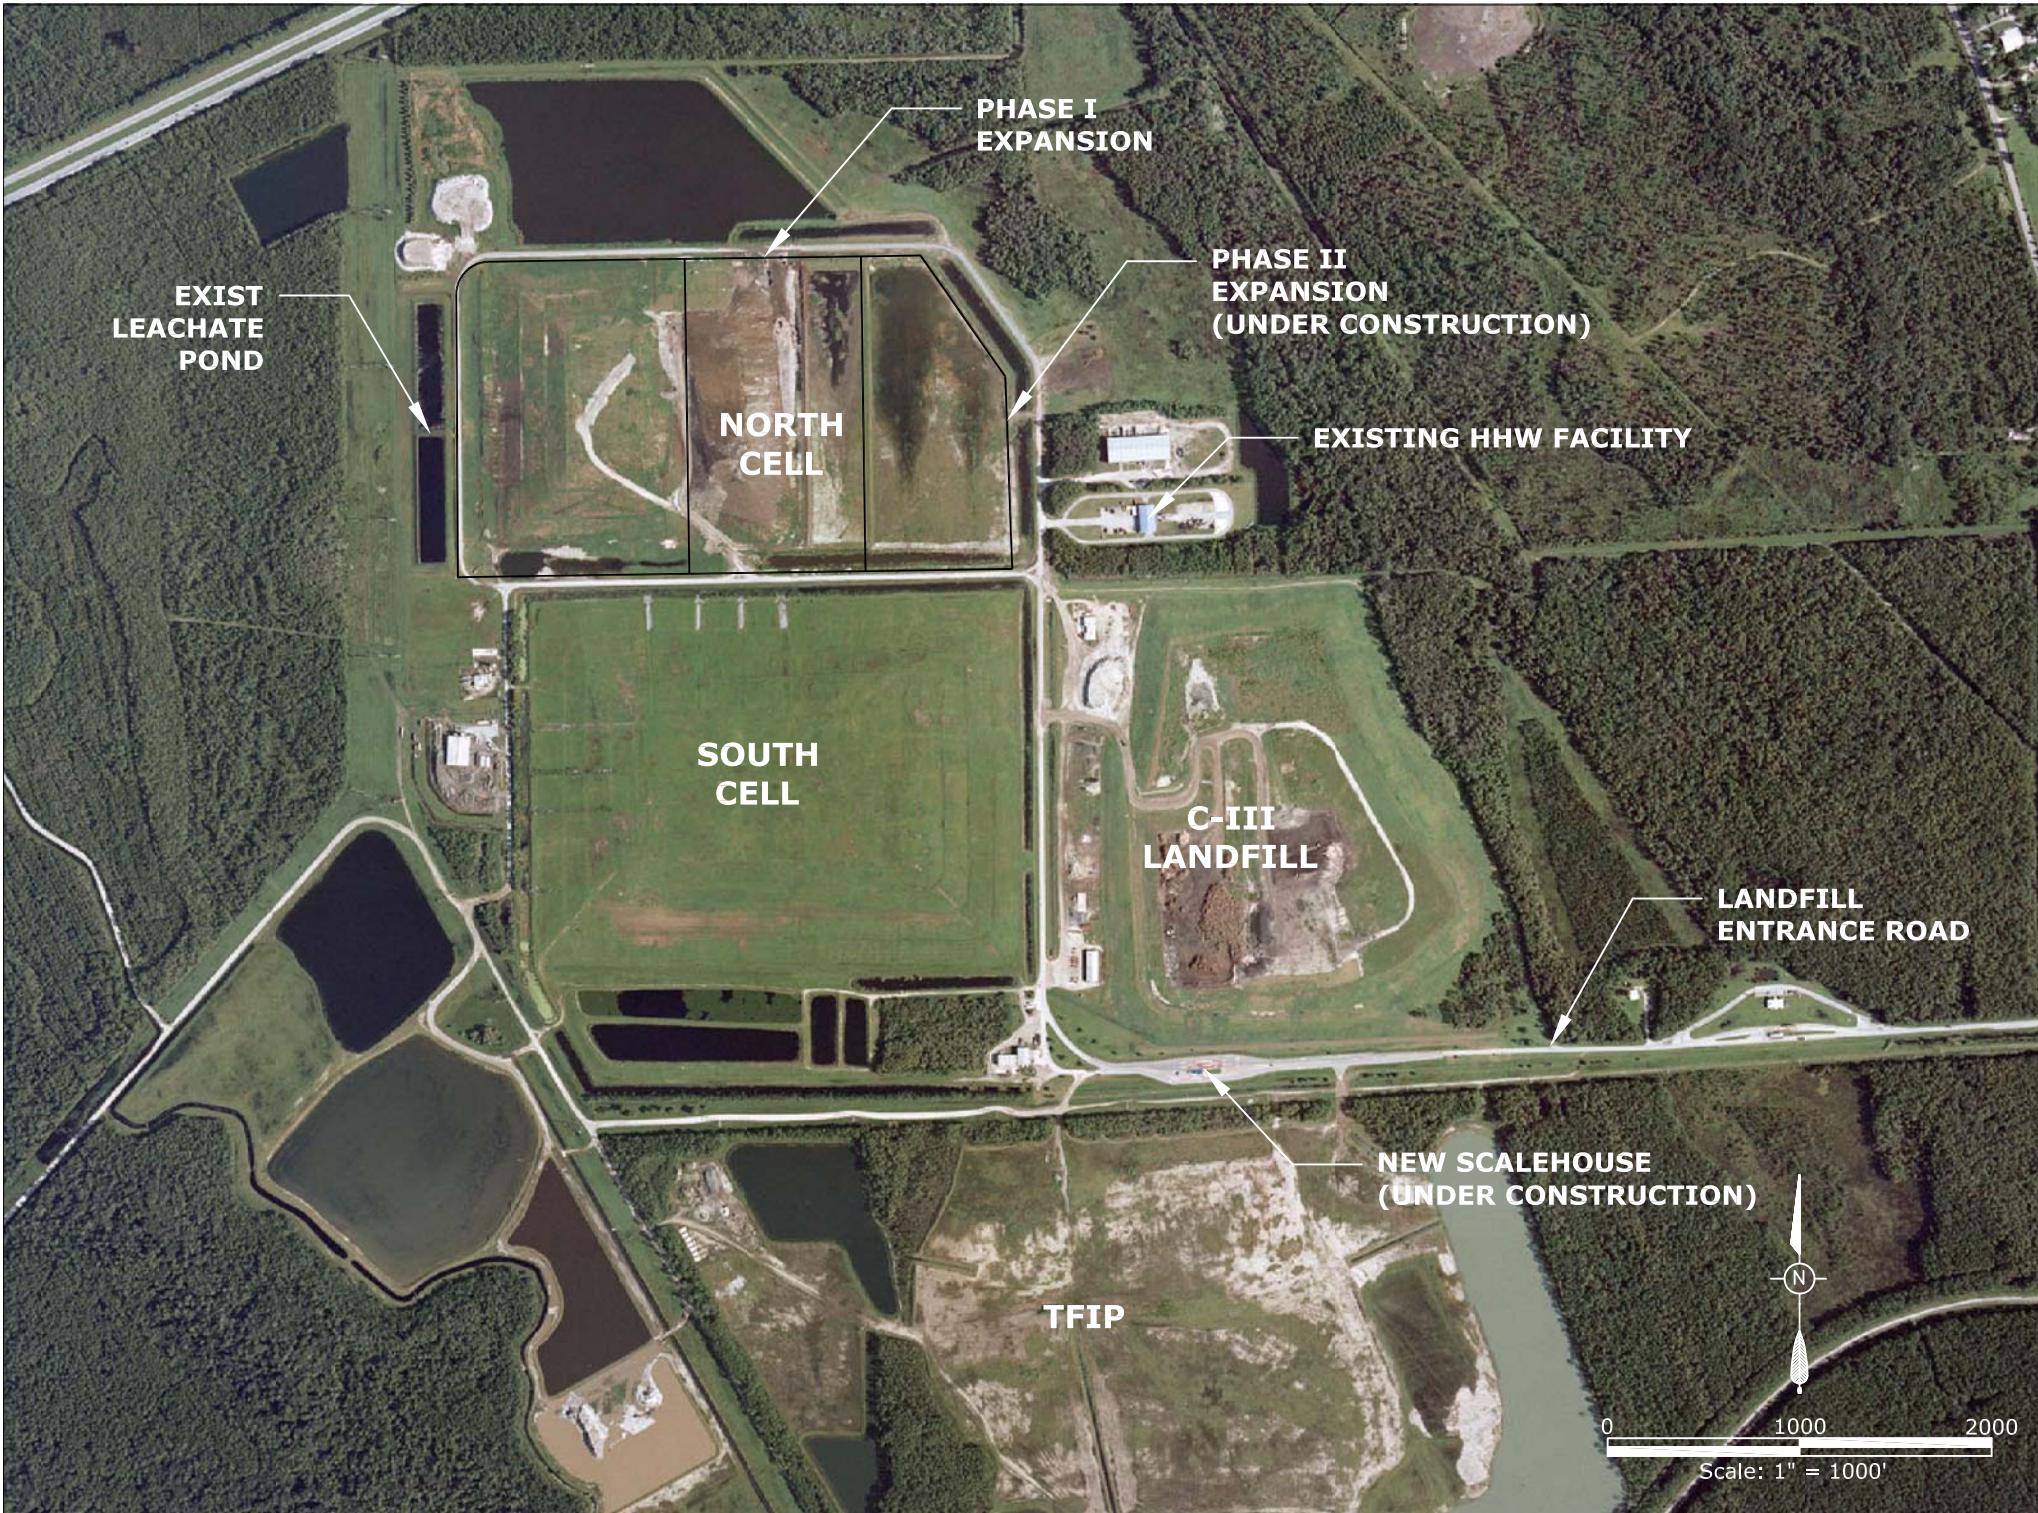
TOMOKA FARMS ROAD LANDFILL SITE PLAN
